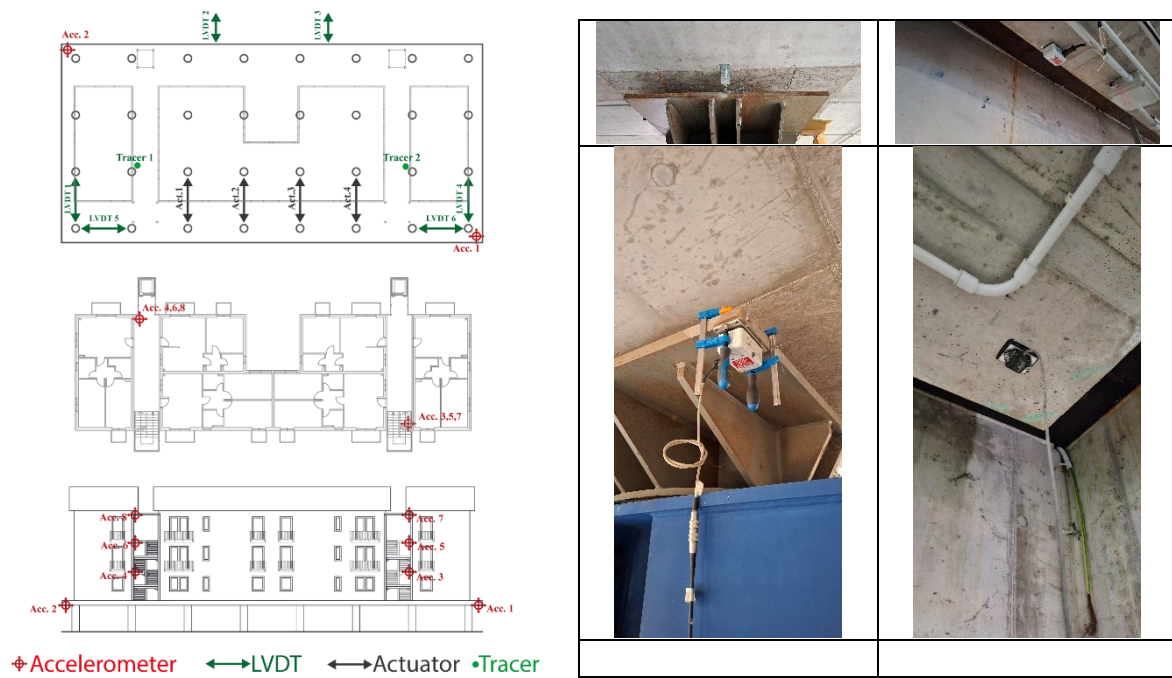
Technical drawings and photos of instrumentation layout in case-study.
